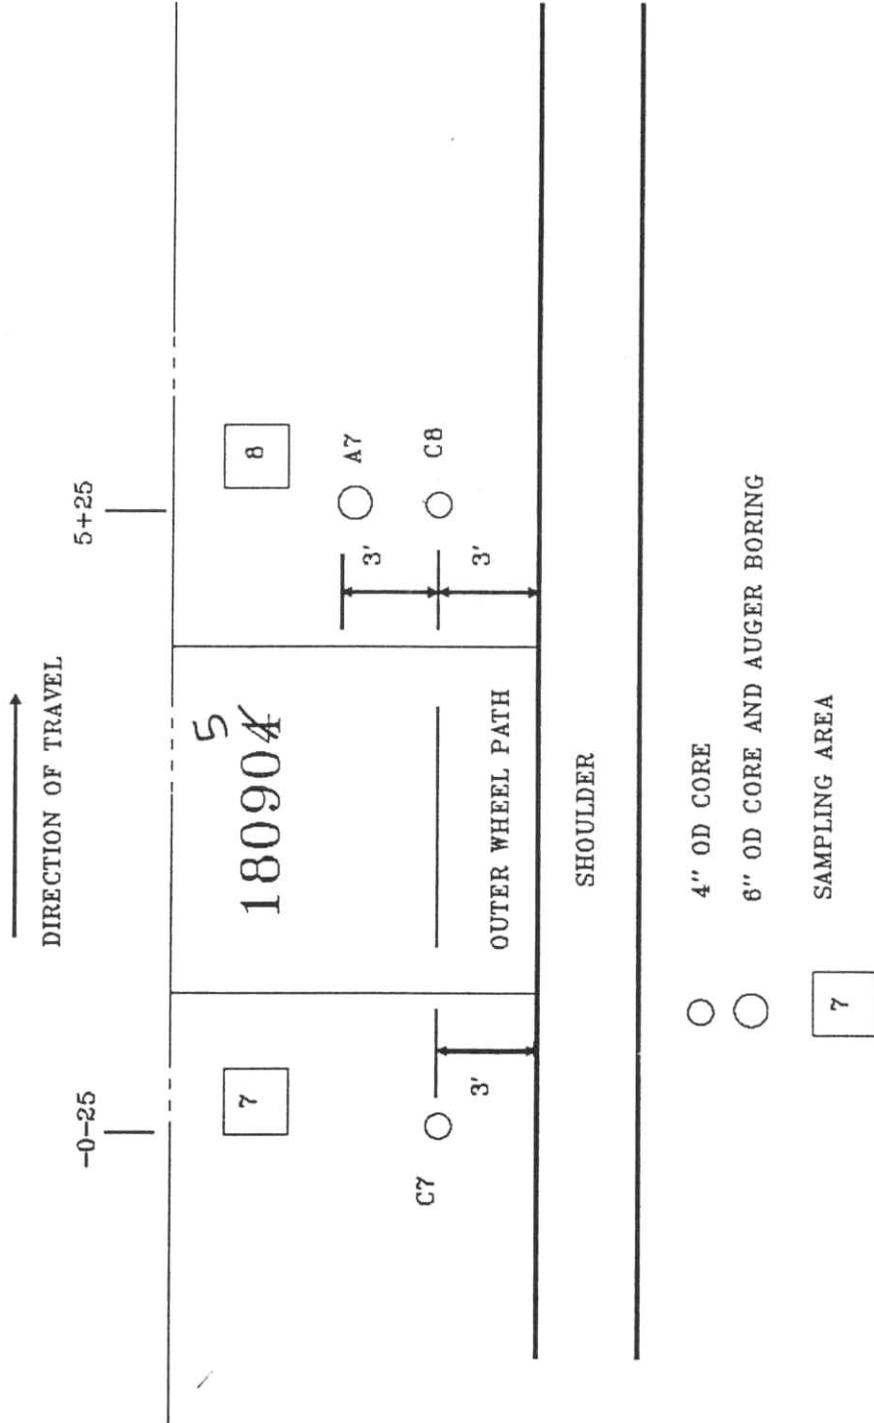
Sampling Plan for ^{SHRP} State Section 180904⁵
